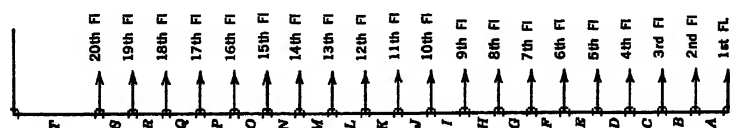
TYPICAL RISER FOR 20-STORY BUILDING
